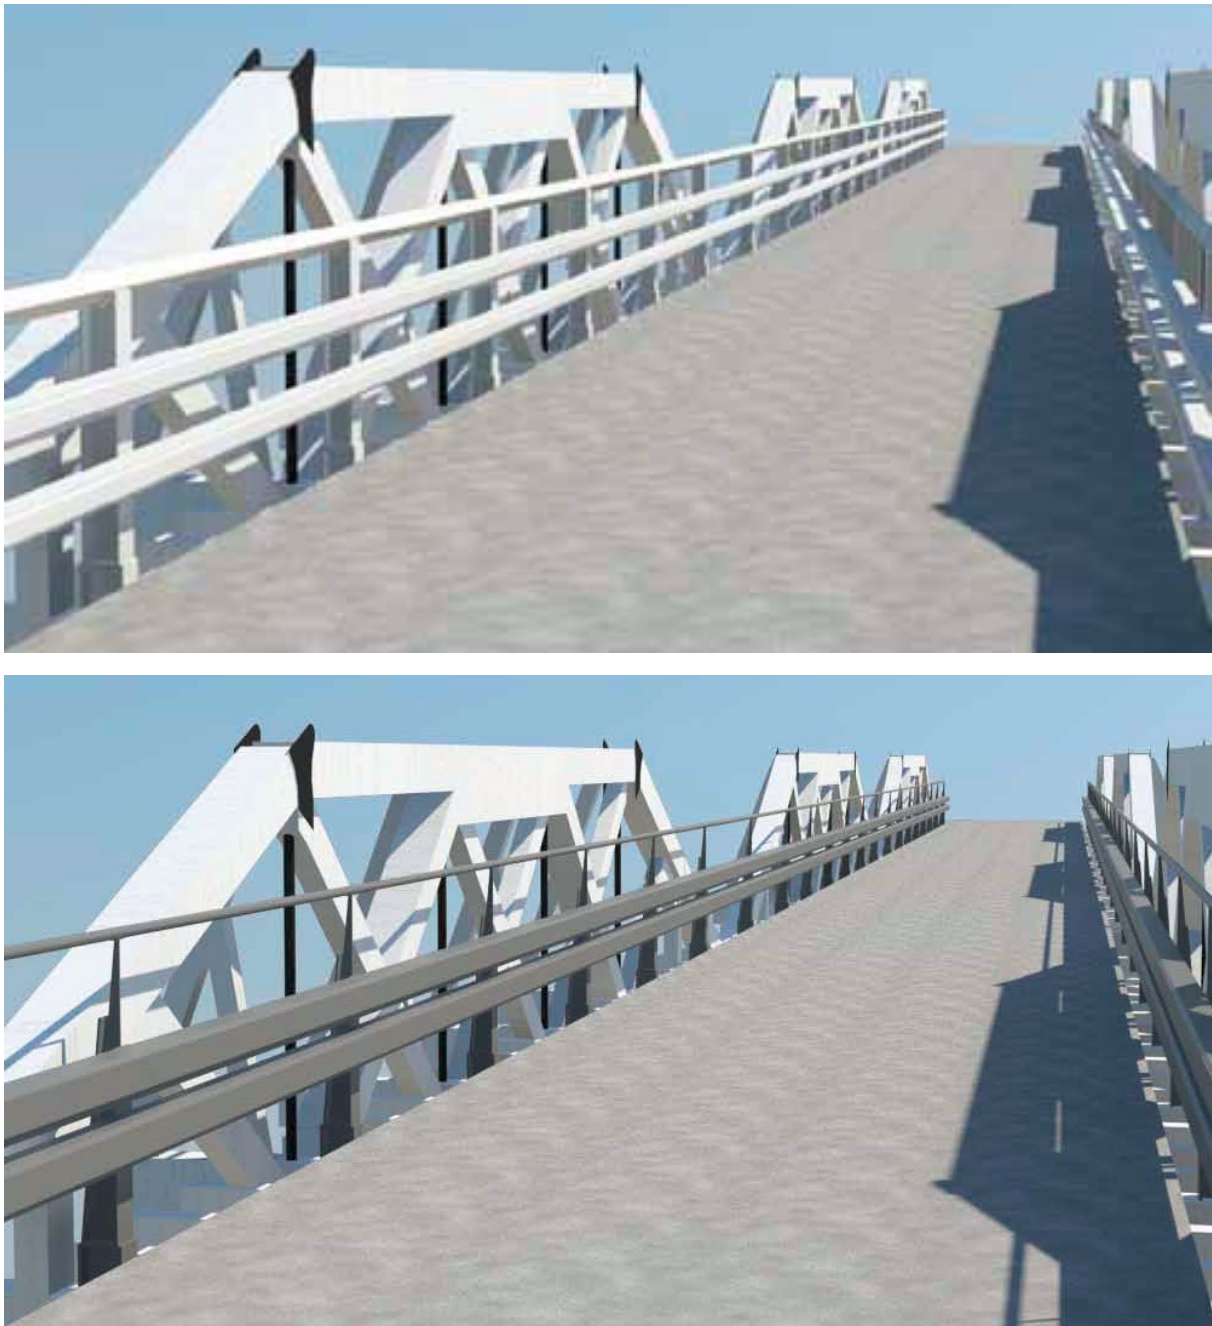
Top: “ordnance style” steel barrier, bottom: architect designed barrier for Old PWD truss
